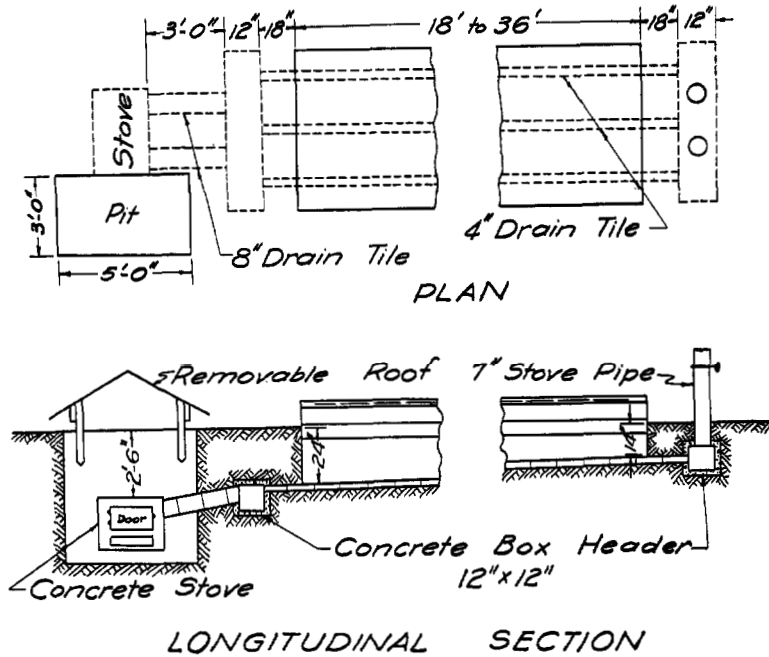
Plan and longitudinal view of flue-heated hotbed showing concrete stove and headers.
